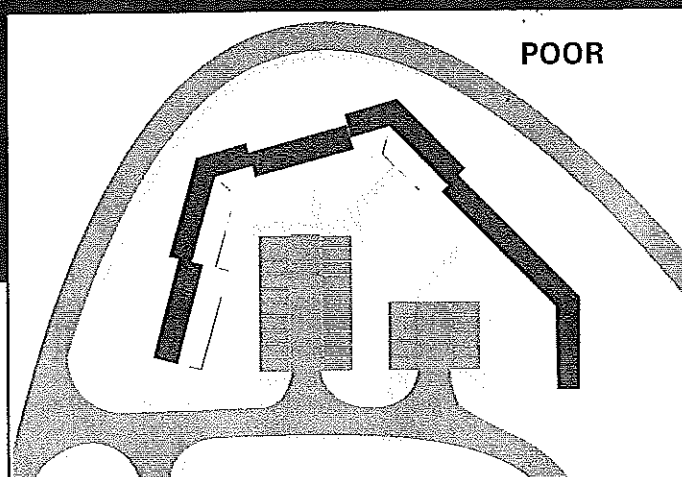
HOUSING LAYOUT & ROAD COMPOSITION
